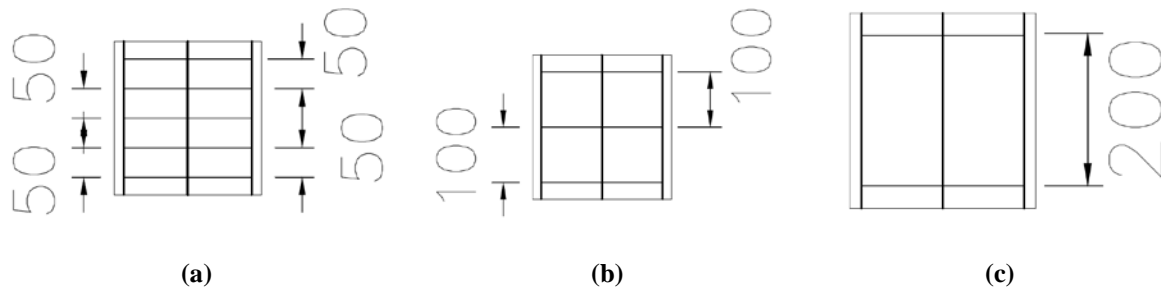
Longitudinal section shows details about the transverse reinforcement spacing for specimens with cross-section (250*250 mm); (a) S = 50 mm; (b) S = 100 mm; (c) S = 200 mm.
